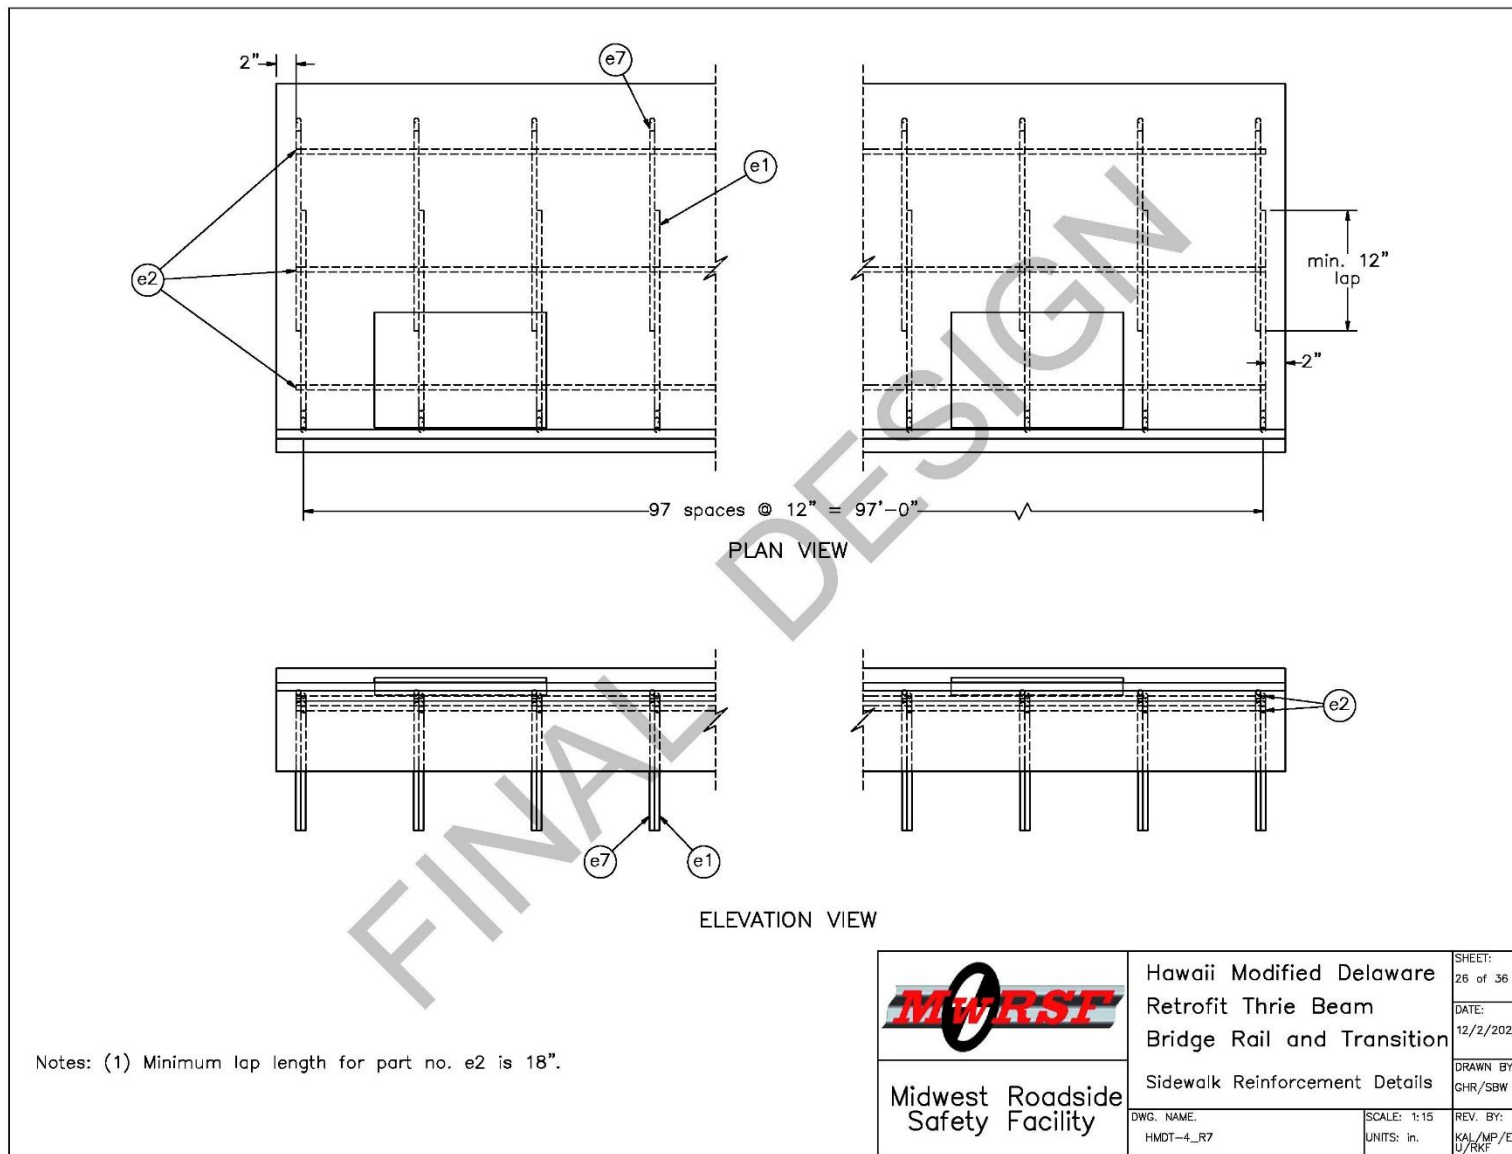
Sidewalk Reinforcement Details, Test No. HMDT-4
